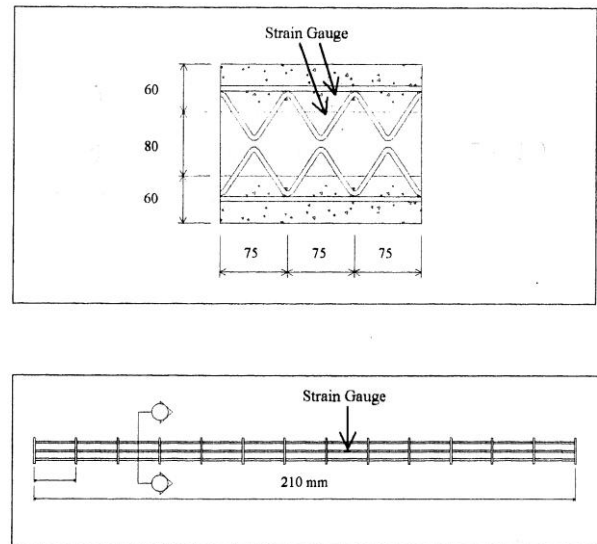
Positions of the strain gauges on connector dan longitudinal reinforcement bars
